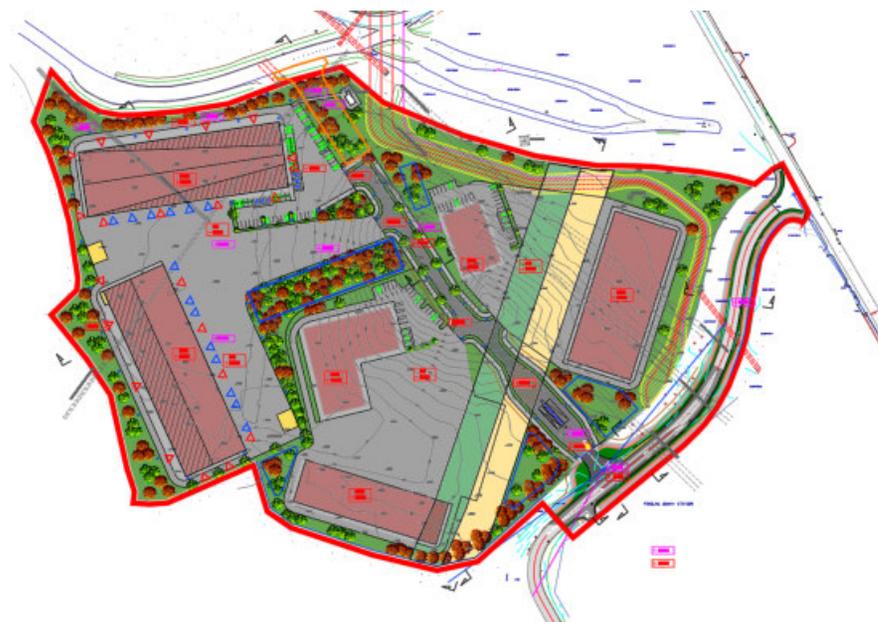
SITE PLAN OF OVERALL CIRCULAR ECONOMY HUB MASTERPLAN
